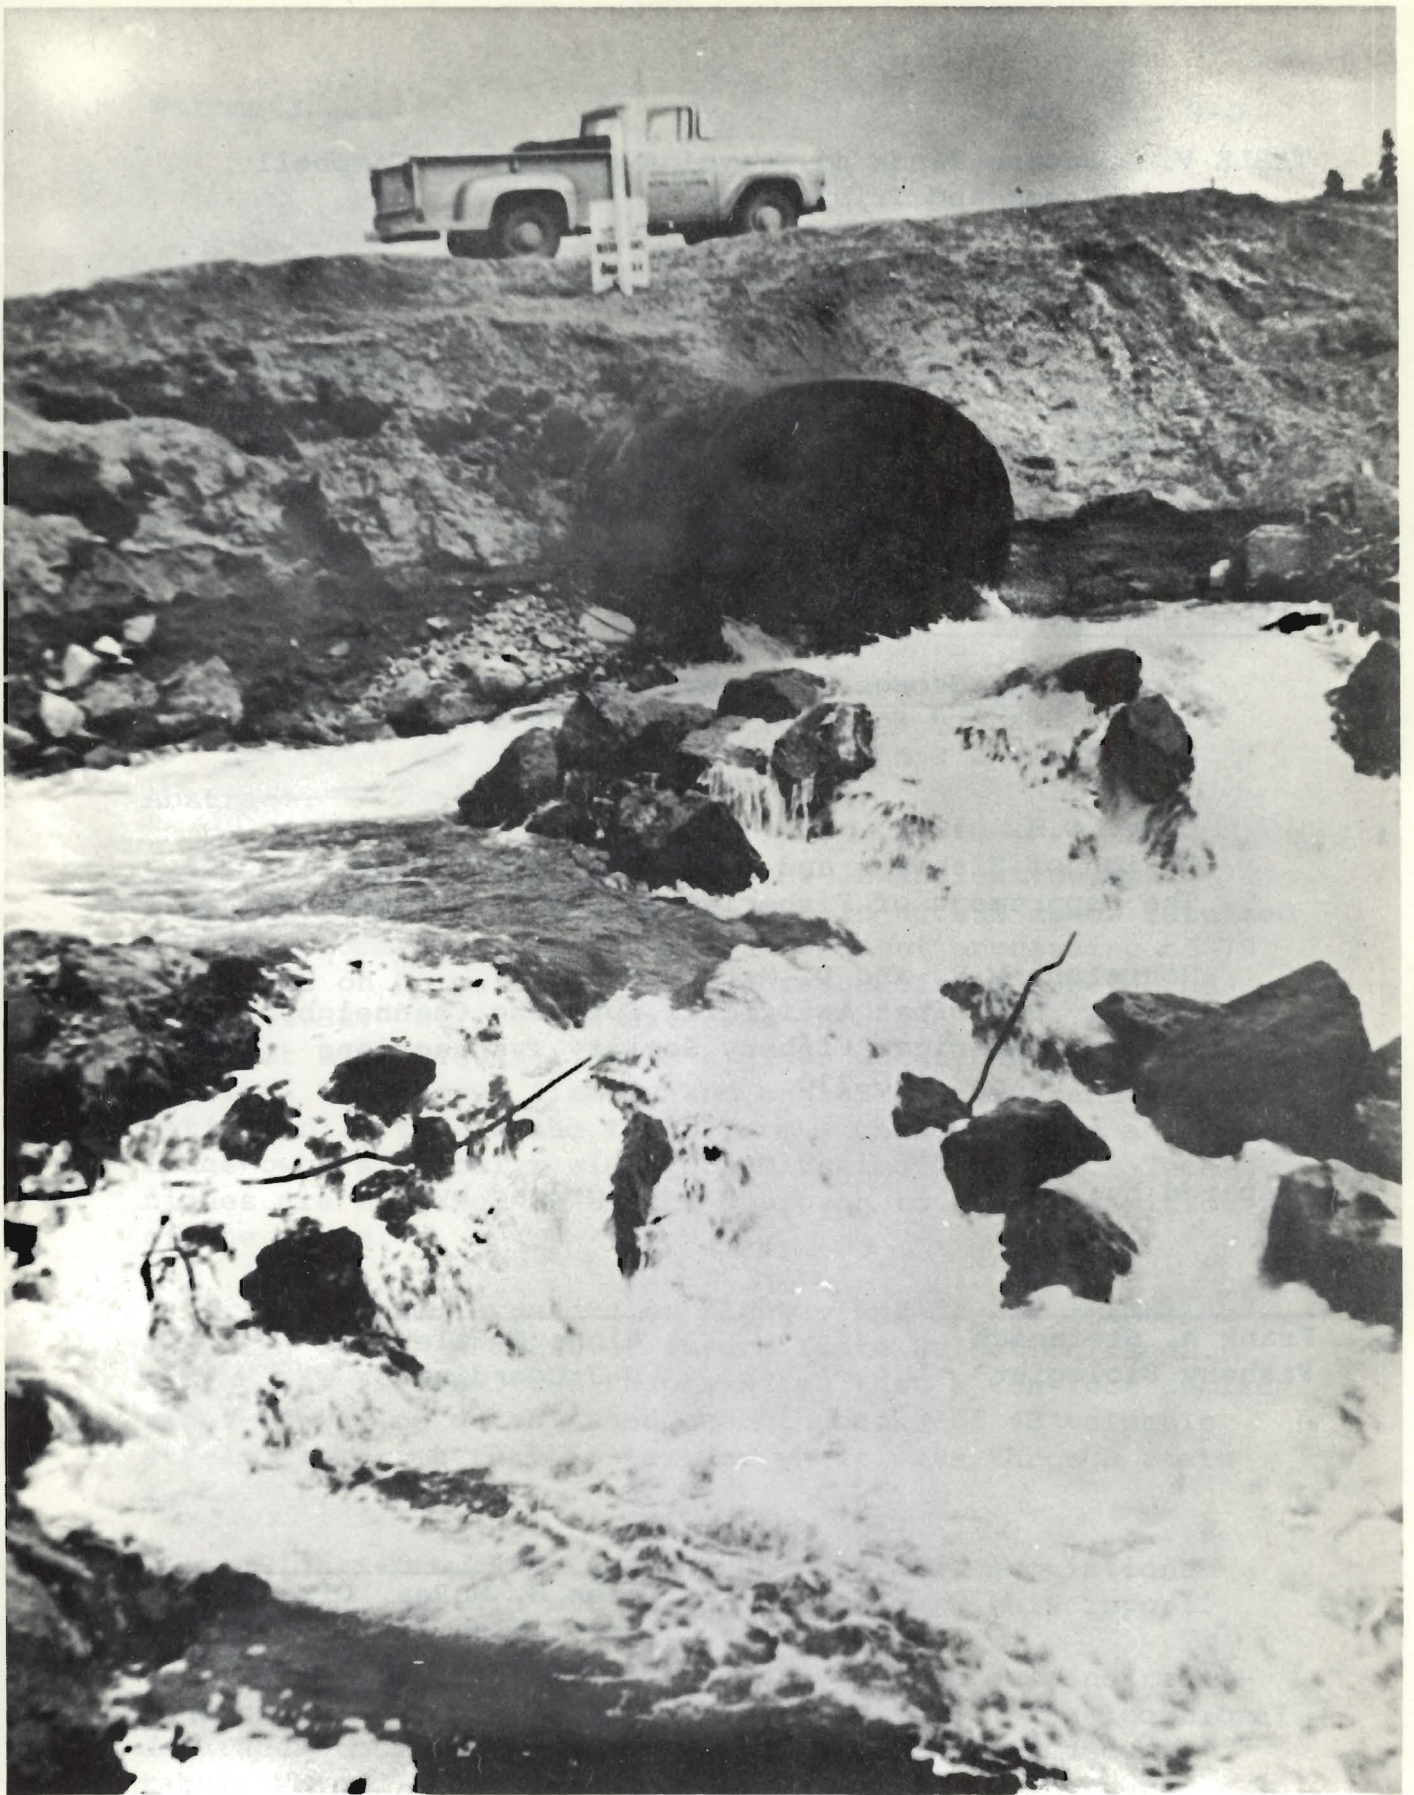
Outlet of Culvert at Campbell Creek Dam, Showing Boulder-formed Pool. Original Stream bed is in Lower Right Corner of Picture.
